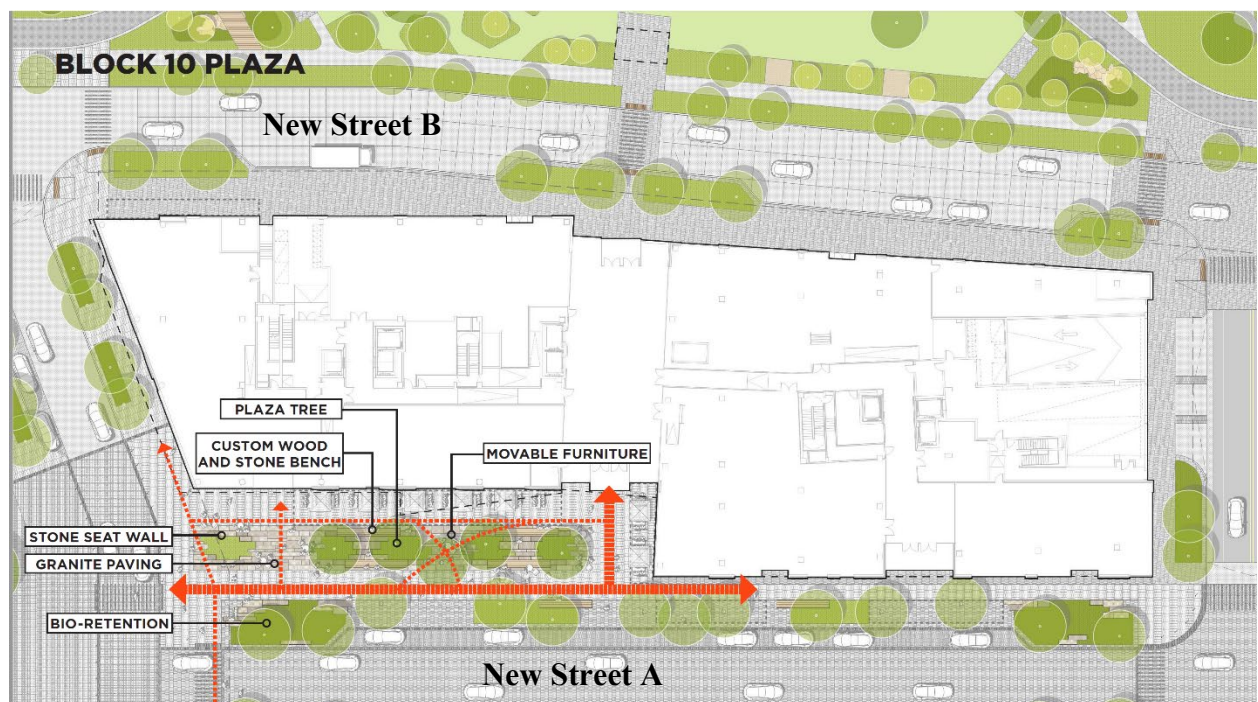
Building #10 Southeast Corner (PYDAC Presentation 8/26/20)
